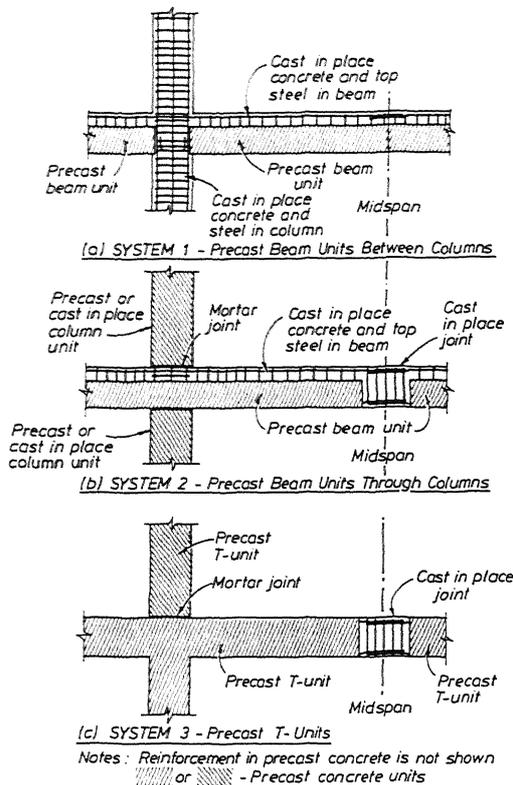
Arrangements of precast members and cast in place concrete for constructing moment resisting reinforced concrete frames.
